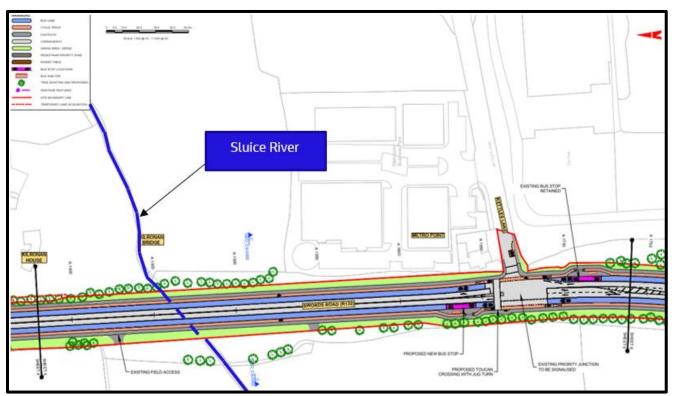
Proposed works around the crossing with Sluice River on R132 (around Ch. A01 + 450)
